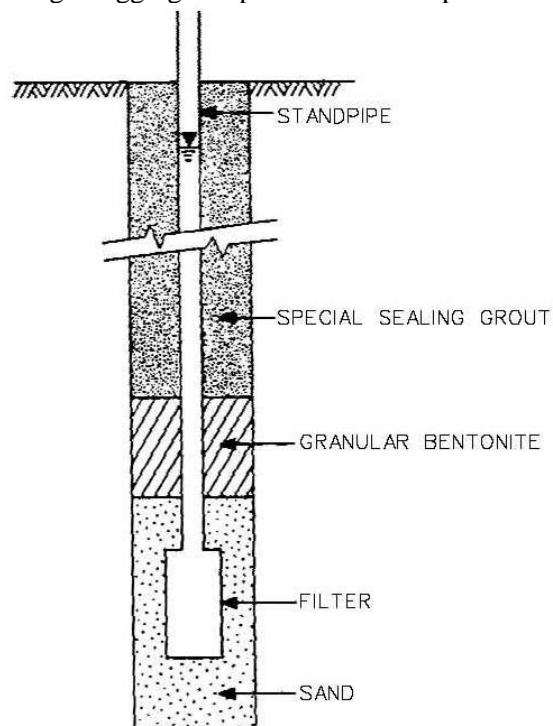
Schematic of Open Standpipe Piezometer Installed in Borehole
